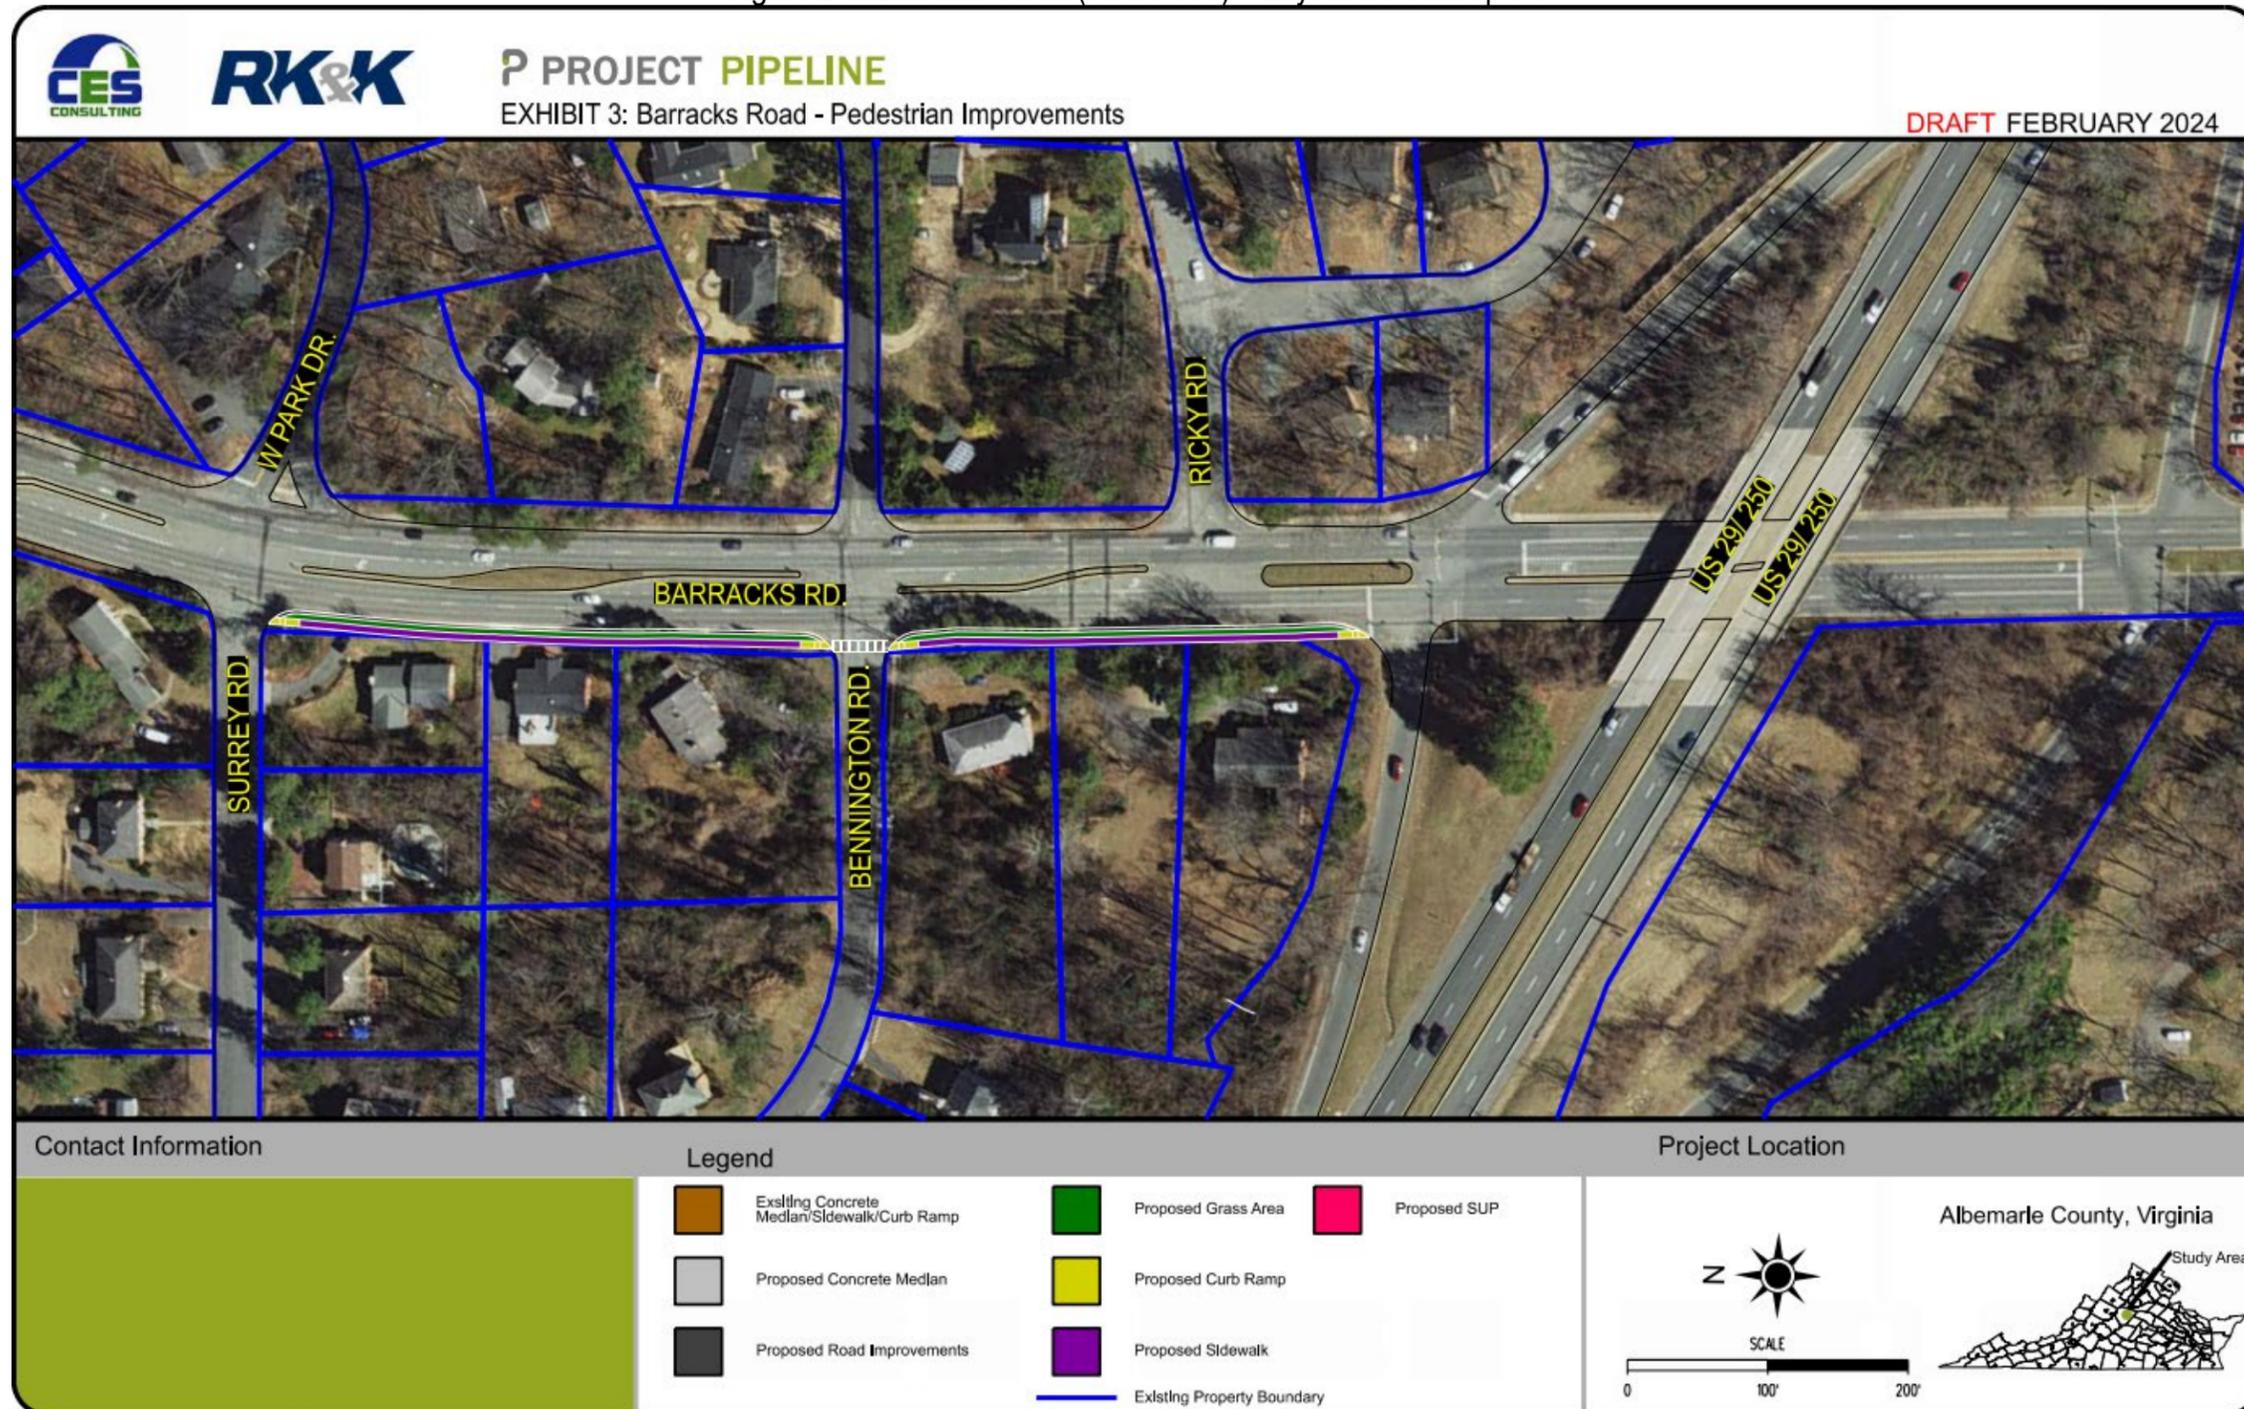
Barracks Road (Route 654) – Layout for Concept 4
